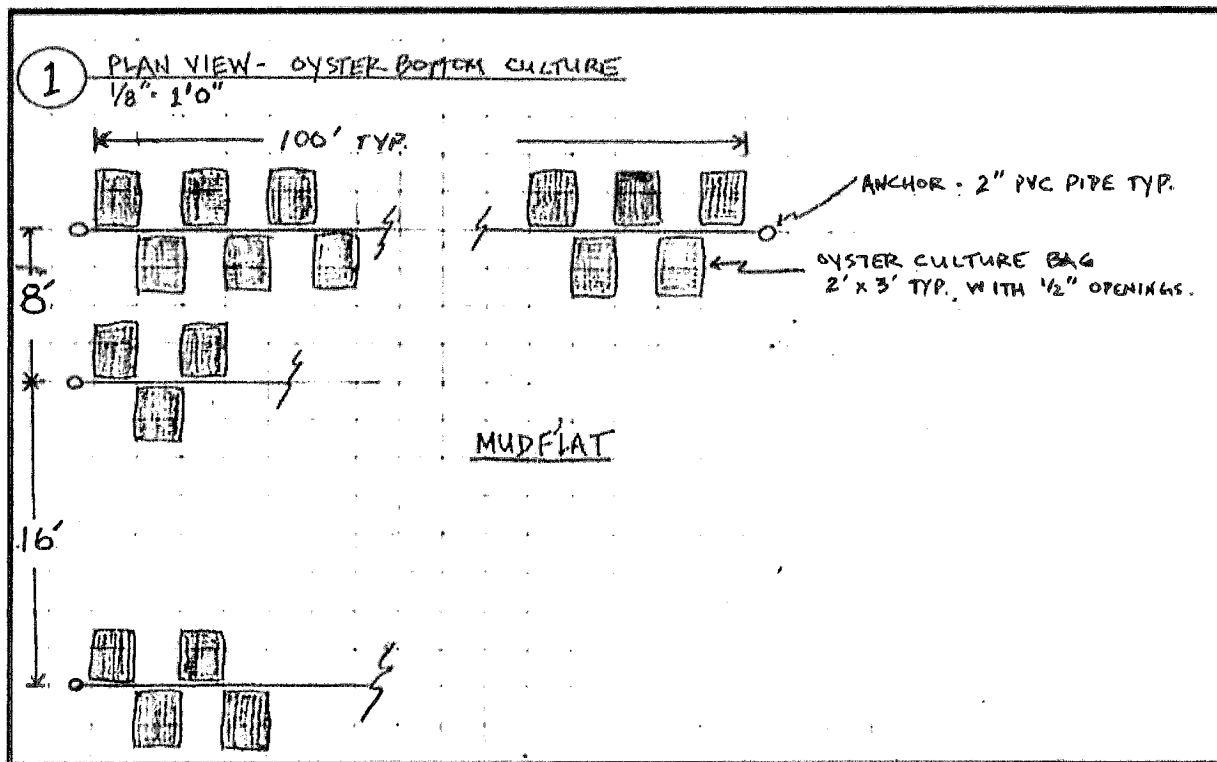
Typical On-Bottom Bag Culture Layout (Note: HIOC does not currently include a 16' space between groups of bags. The plan shown is otherwise correct)
